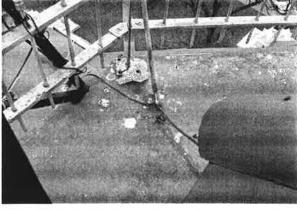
The flat roofing at the top of the dome seems to be in good condition. None of the seams were found to be cracked. However, some minor deterioration was noted at the cresting attachments.
